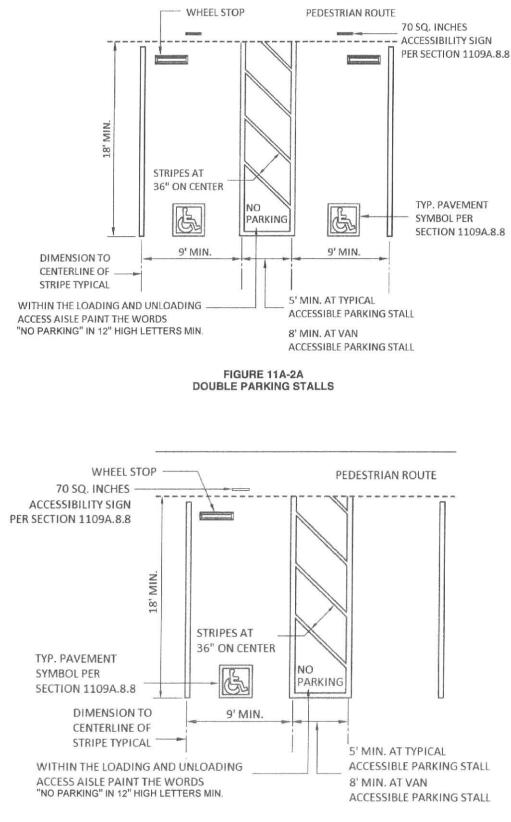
A-2B SINGLE AND VAN ACCESSIBLE PARKING STALLS
